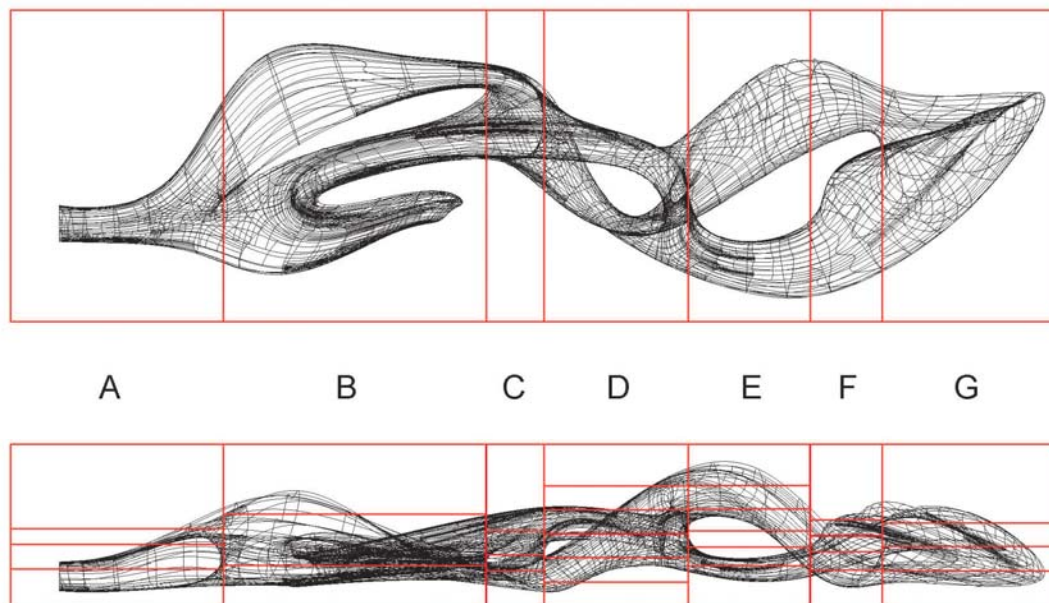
Elevation and plan view of branch structure. Red lines indicate cuts in the form to allow for fabrication.
